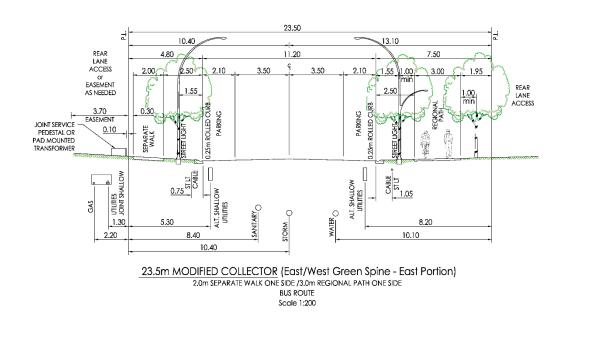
PROVIDENCE Street Cross Sections
